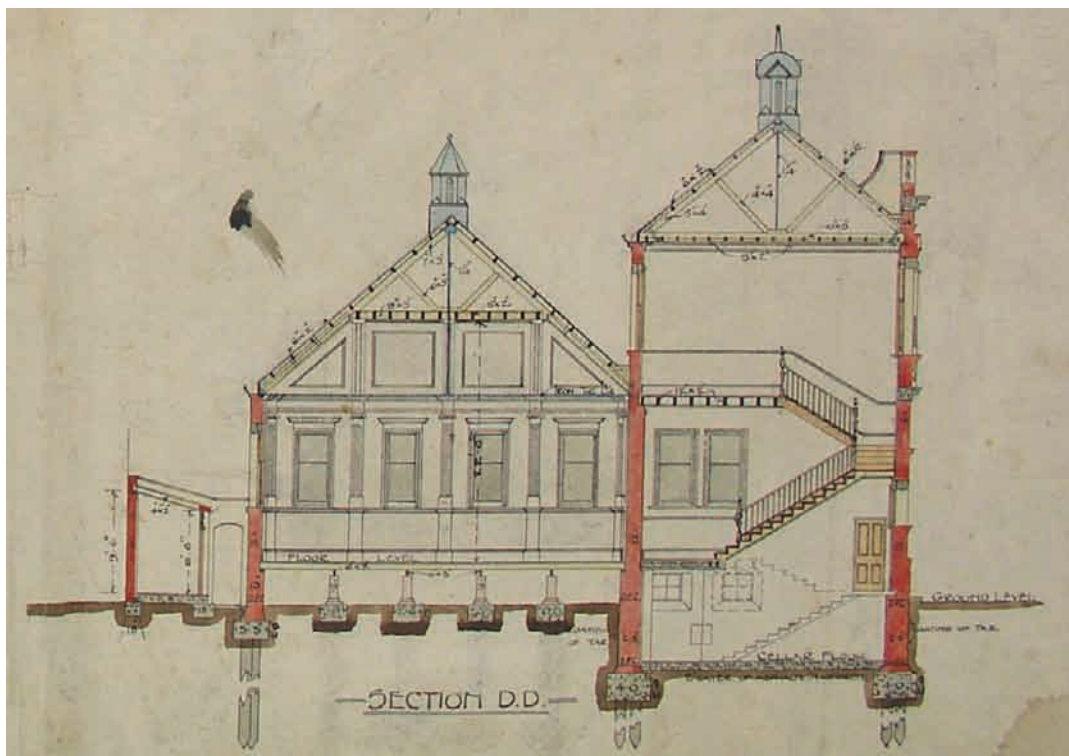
1902 Public Works Department section through the Magistrates Court, including piles, the basement and the brick wall encountered in Test Pit 2.
